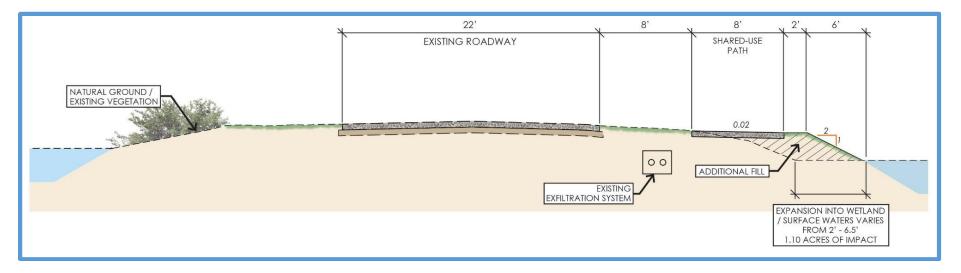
, Typical Section, E-W CANA Alternatives 1B and 2B
